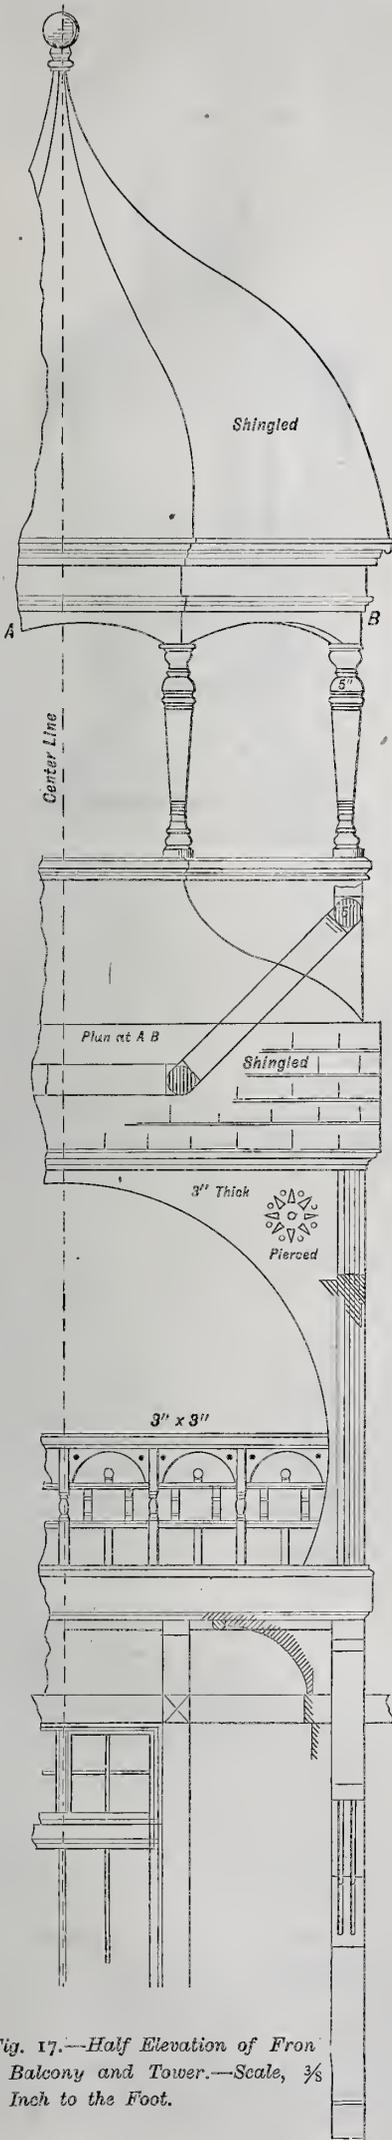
Half Elevation of Front Balcony and Tower.—Scale, $\frac{3}{8}$ Inch to the Foot.
